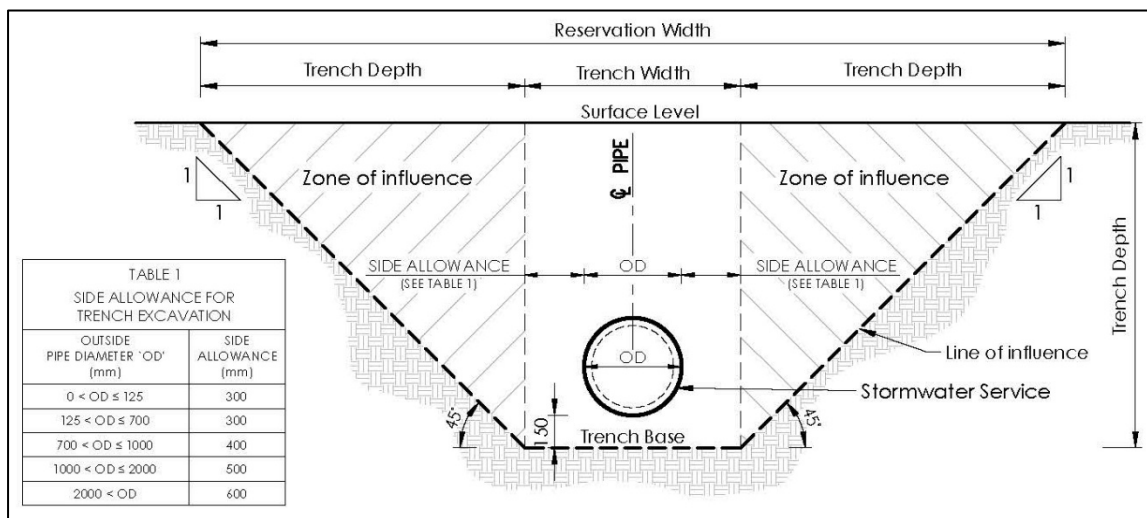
Reservation Width for Underground Stormwater Conduit
